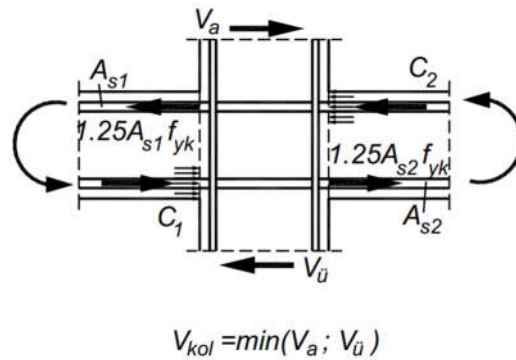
Horizontal forces exerted on an interior joint. (TSC2018, 2018).
